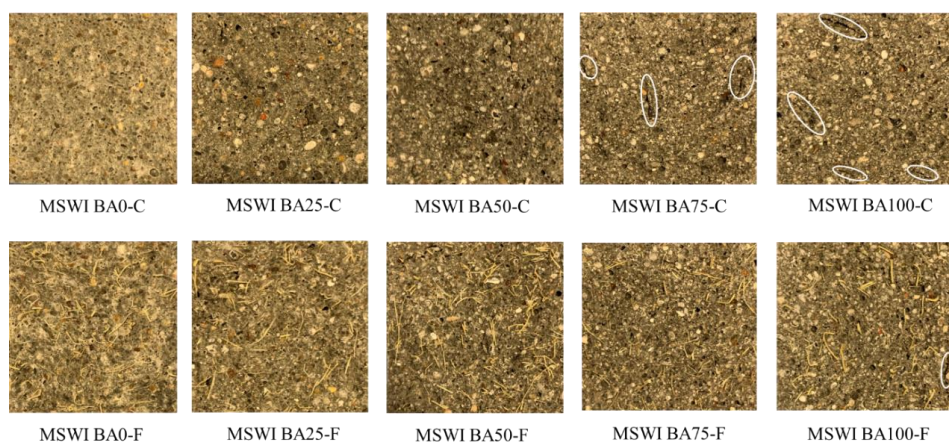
The fracture surface of all mortar specimens (C-control and F- fibers) after the three-point bending test.
